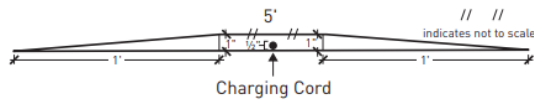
CROSS-SECTION OF RAMP REQUIREMENTS FOR OVER 1/2 INCH HEIGHT, EXAMPLE BASED ON A TOTAL HEIGHT OF 1 INCH
